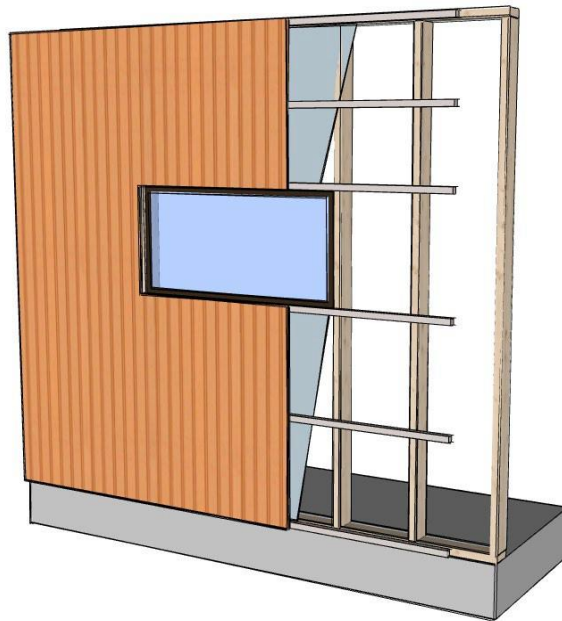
Structural battens used for vertical cladding over a framed structural wall
